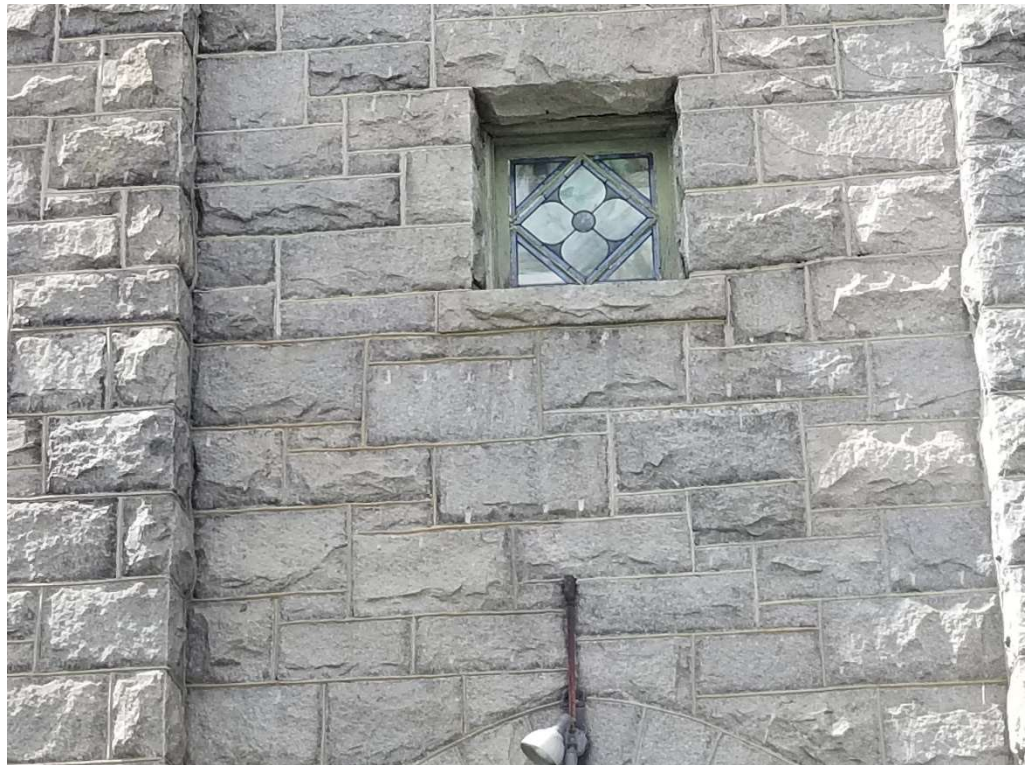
Exterior stone masonry in random ashlar pattern with beaded mortar joints.
